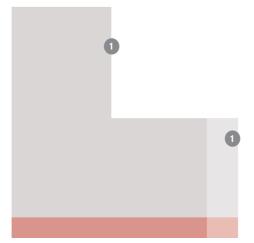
Building C (Enterprise Yard side) - façade principles 01 (illustrative)
